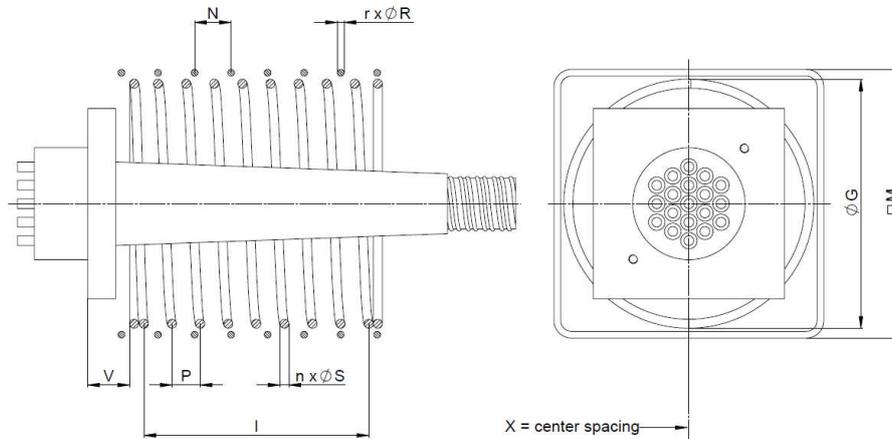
Local anchorage zone reinforcement type E @ 23/28 MPa
